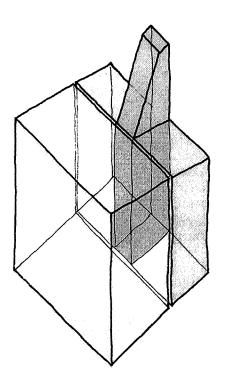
The chimney as a ventilation element used to spatially organise the house; vertical and without bends, and with the kitchen and bathroom located around the chimney.
